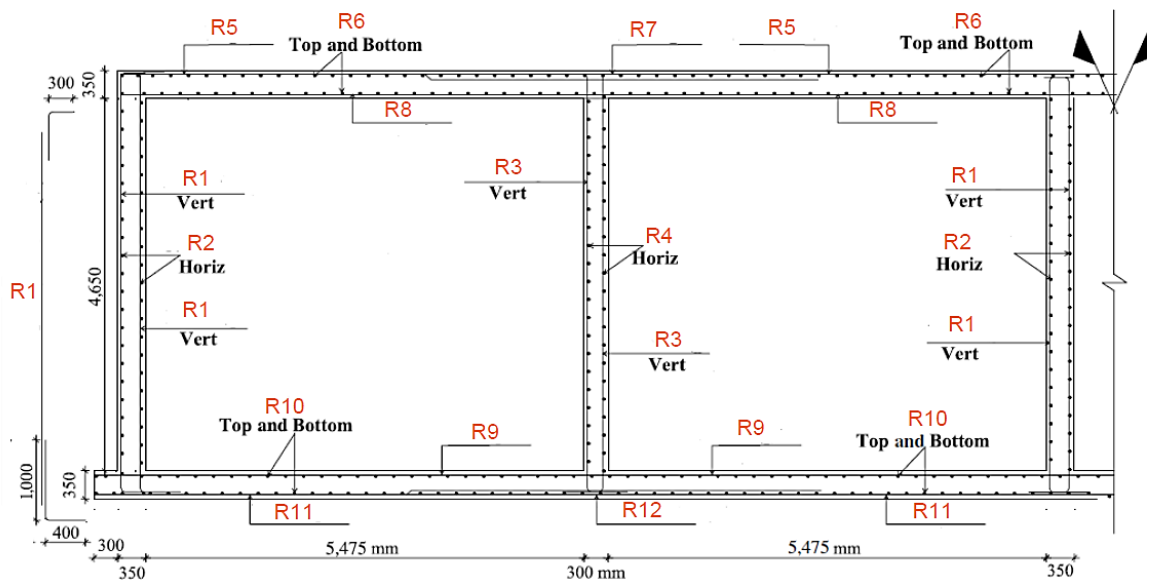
Reinforcement details for the main vertical cross-section of the water tank (adapted, with modifications, from [258]).
